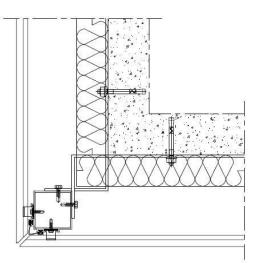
External corner with mitre joint and corner profile. FAVEKER® FV GA16 FTS502B system.
